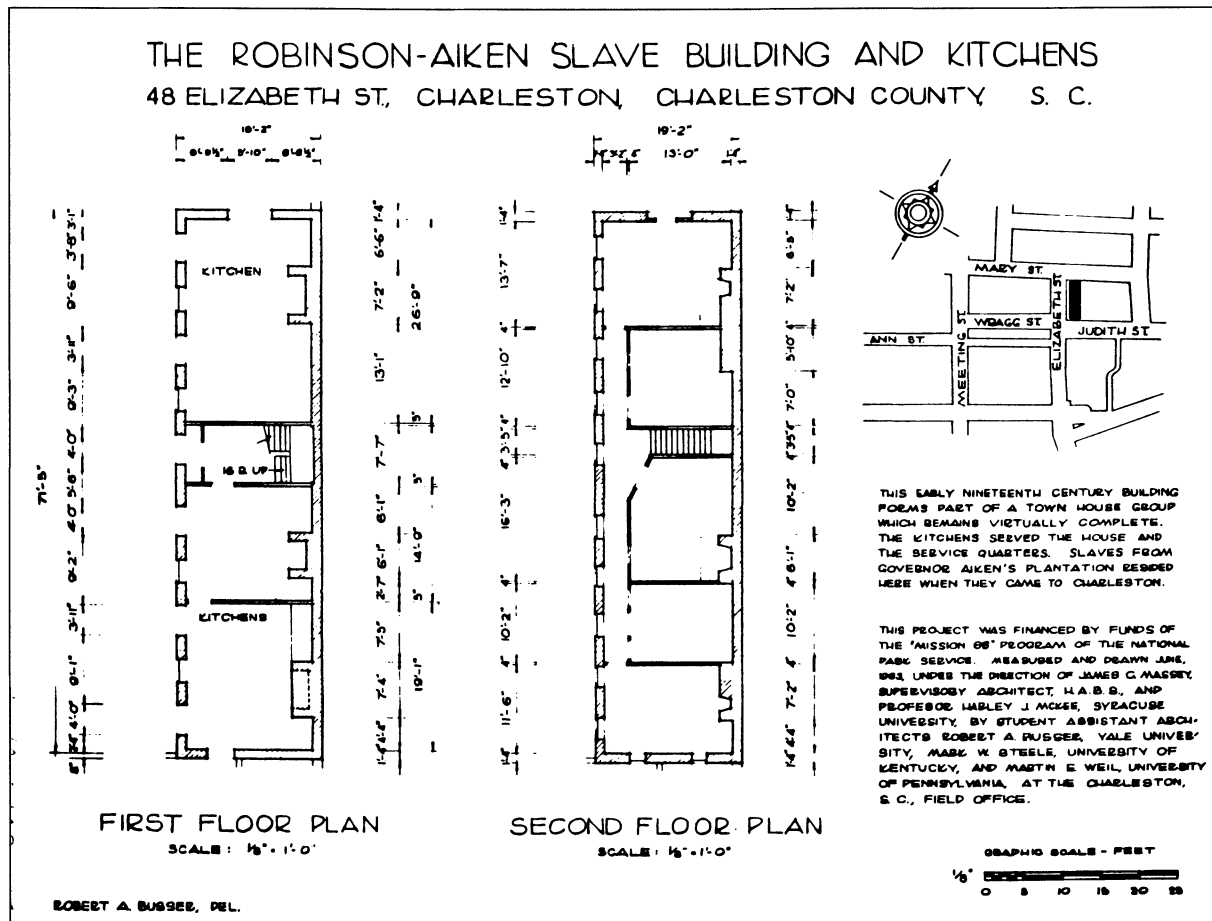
Plan of the Slave Quarter Located on the Second Floor of the Kitchen Wing of the Aiken-Rhett House, Charleston, South Carolina. Drawn by Robert A. Bussey, 1963, Historic American Buildings Survey, courtesy of the Library of Congress.
